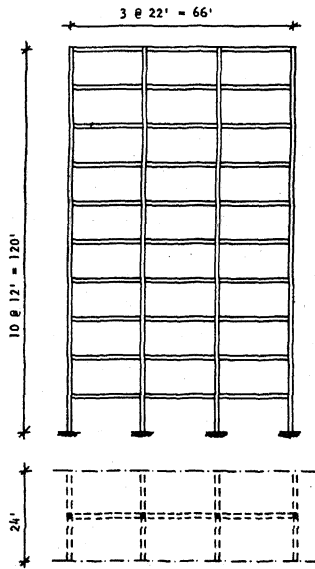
TYPICAL PLAN AND ELEVATION OF BUILDING CONSIDERED
